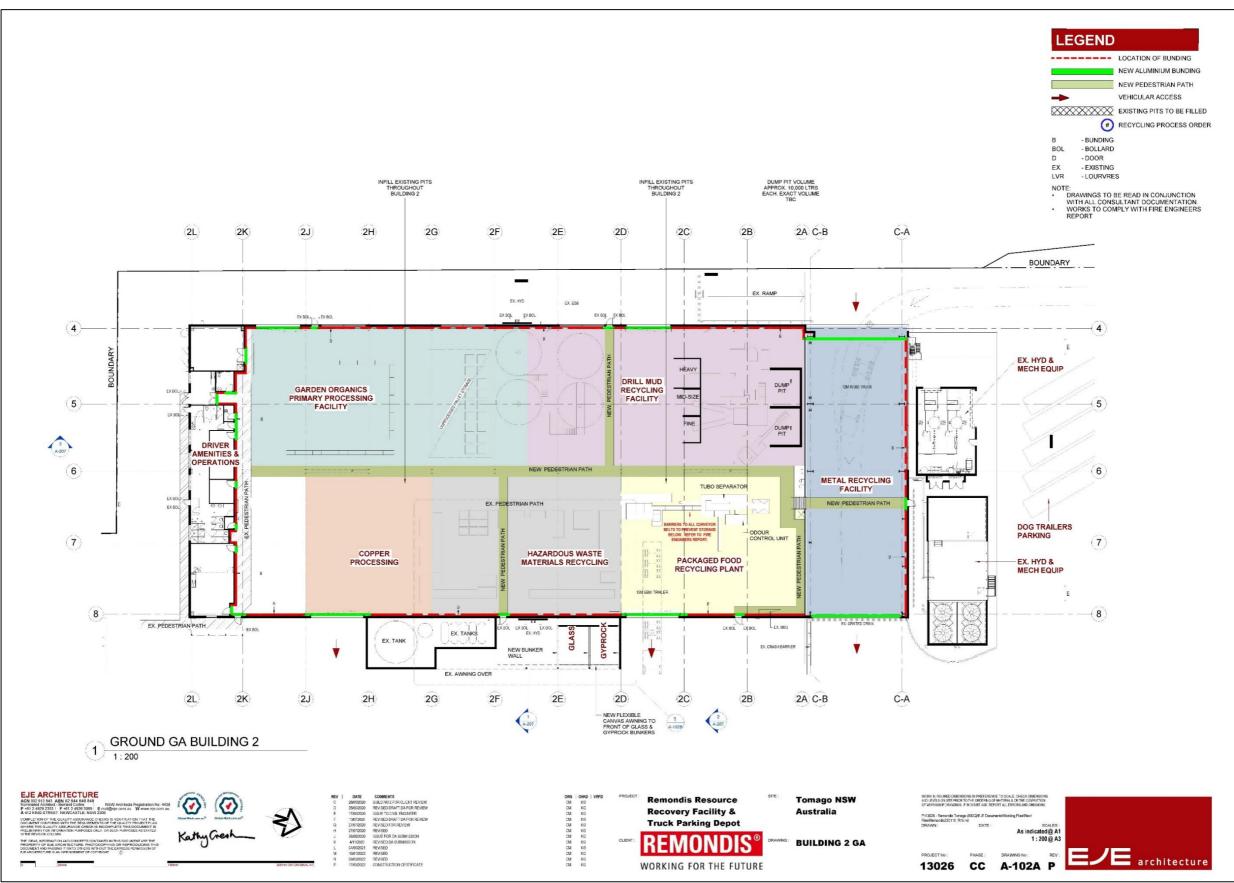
The Tomago Facility: Building 2 General Arrangement (1 of 2)
